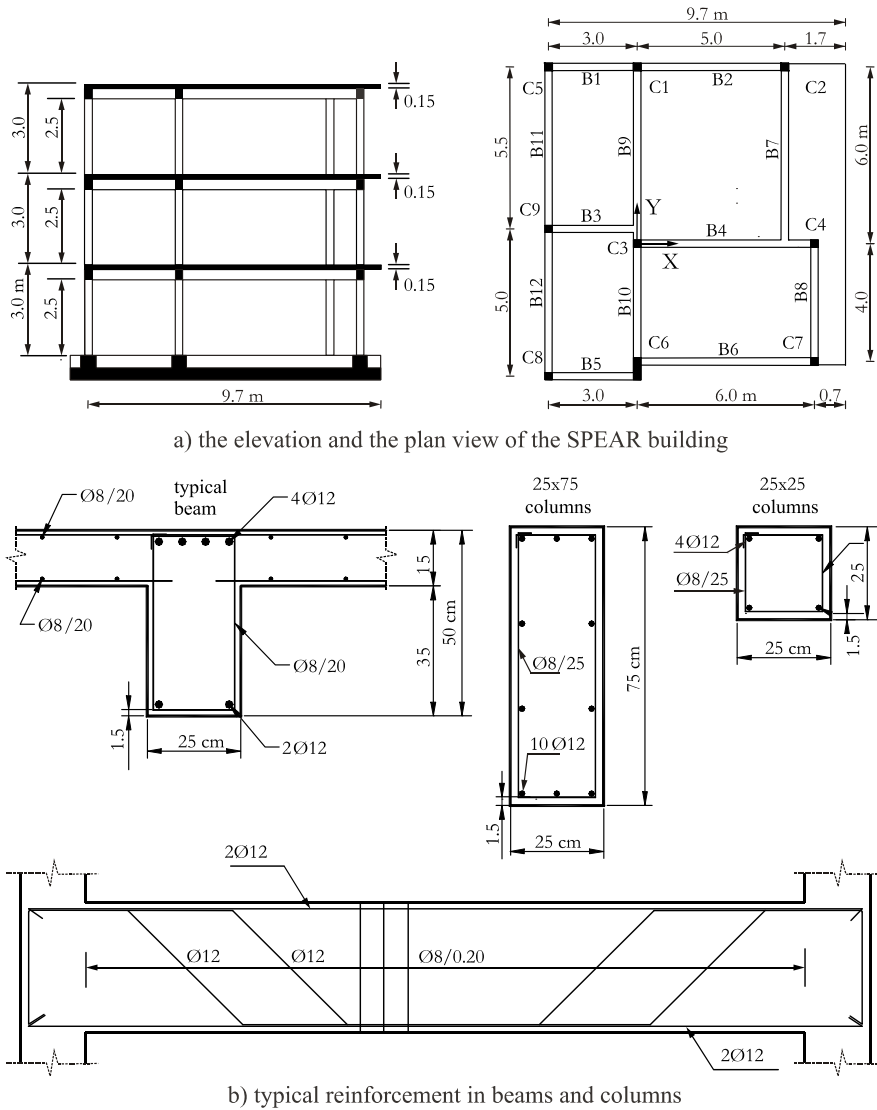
a) The elevation and plan view of example structure, and b) the typical cross-sections and reinforcement in columns and beams.
